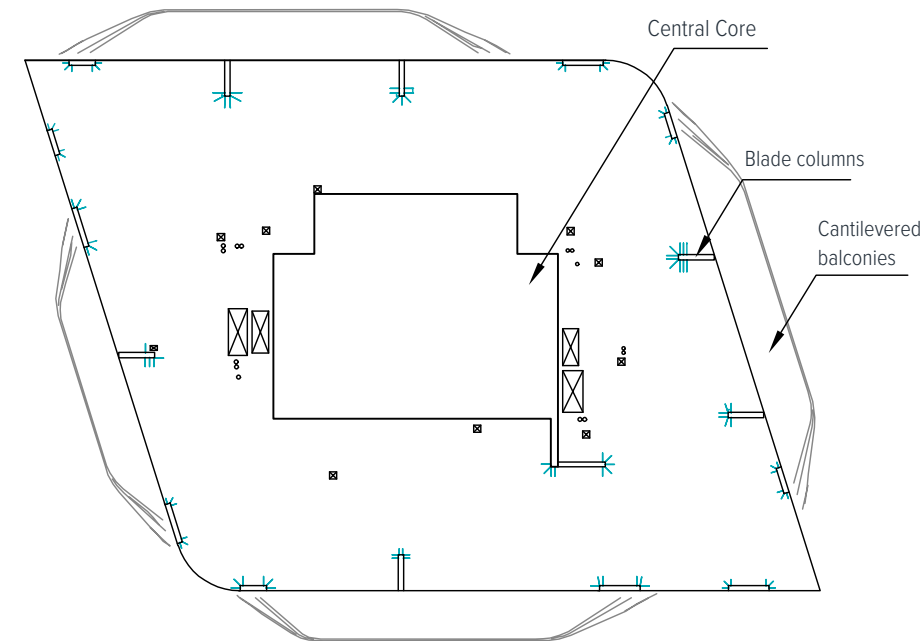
STRUCTURAL LAYOUT OF A TYPICAL FLOOR AT LIGHTHOUSE, ©RAMBOLL.
